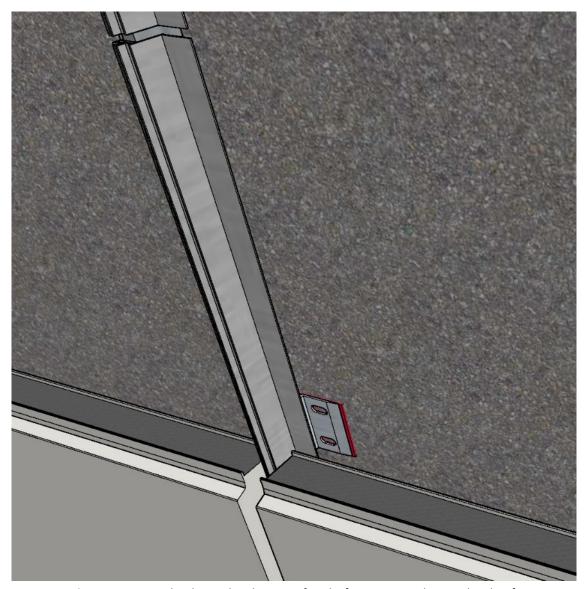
Sandwich panel and existing façade [image created using SketchUp]
